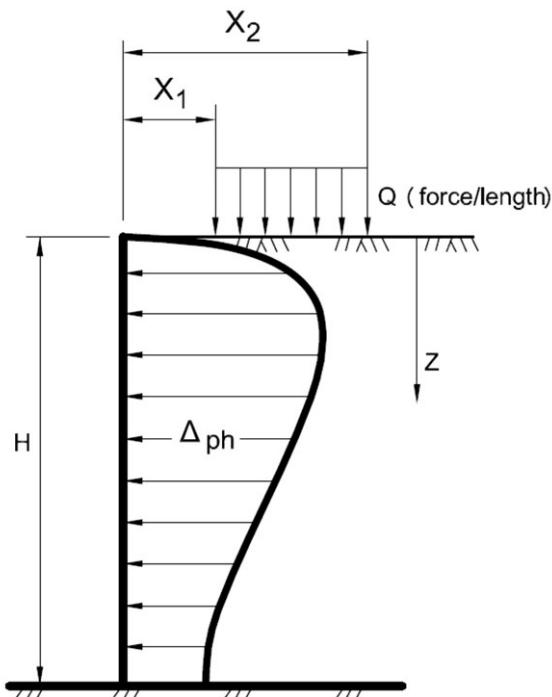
Horizontal Pressure on a Wall Caused by a Finite Line Load Perpendicular to the Wall
